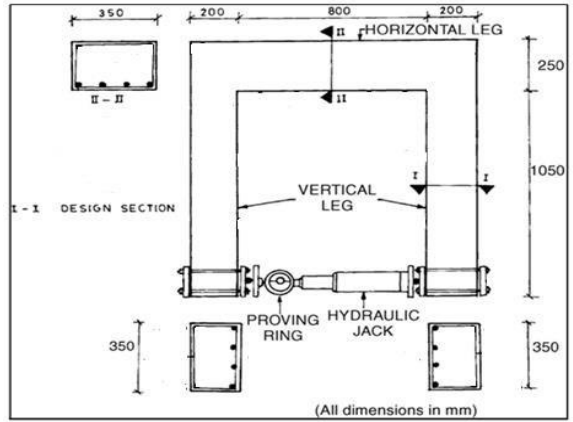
4 Loading arrangement of the Nilsson's (1973) test specimens
